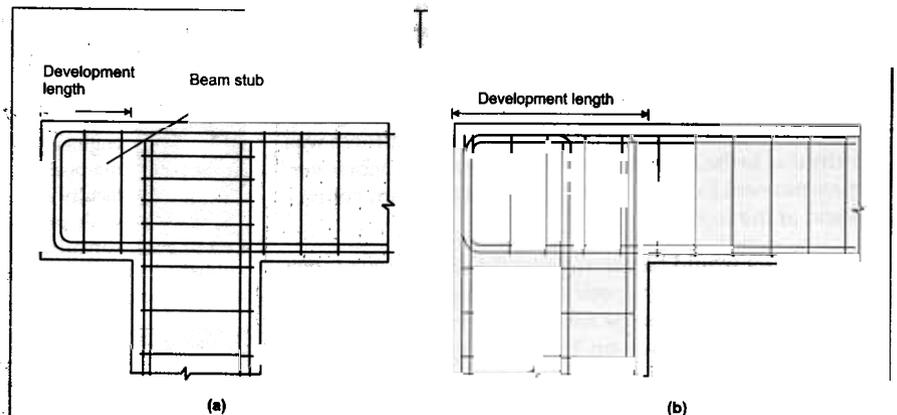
Provisions for improving joint strength (a) beam stub and (b) increasing column depth to beam bar anchorage
